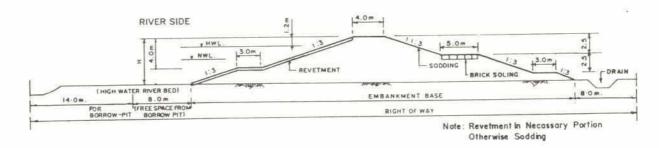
(3) LONGITUDINAL SECTION OF EMBANKMENT : DHAKA EAST (SA, SB AND SC)
